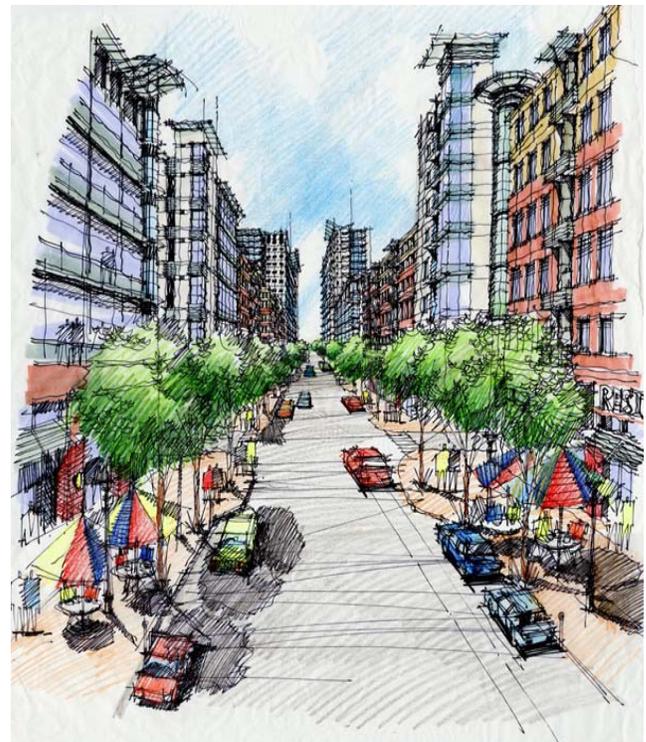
Plan of proposed Simpson Street improvements showing possible pavement treatment and dining areas
